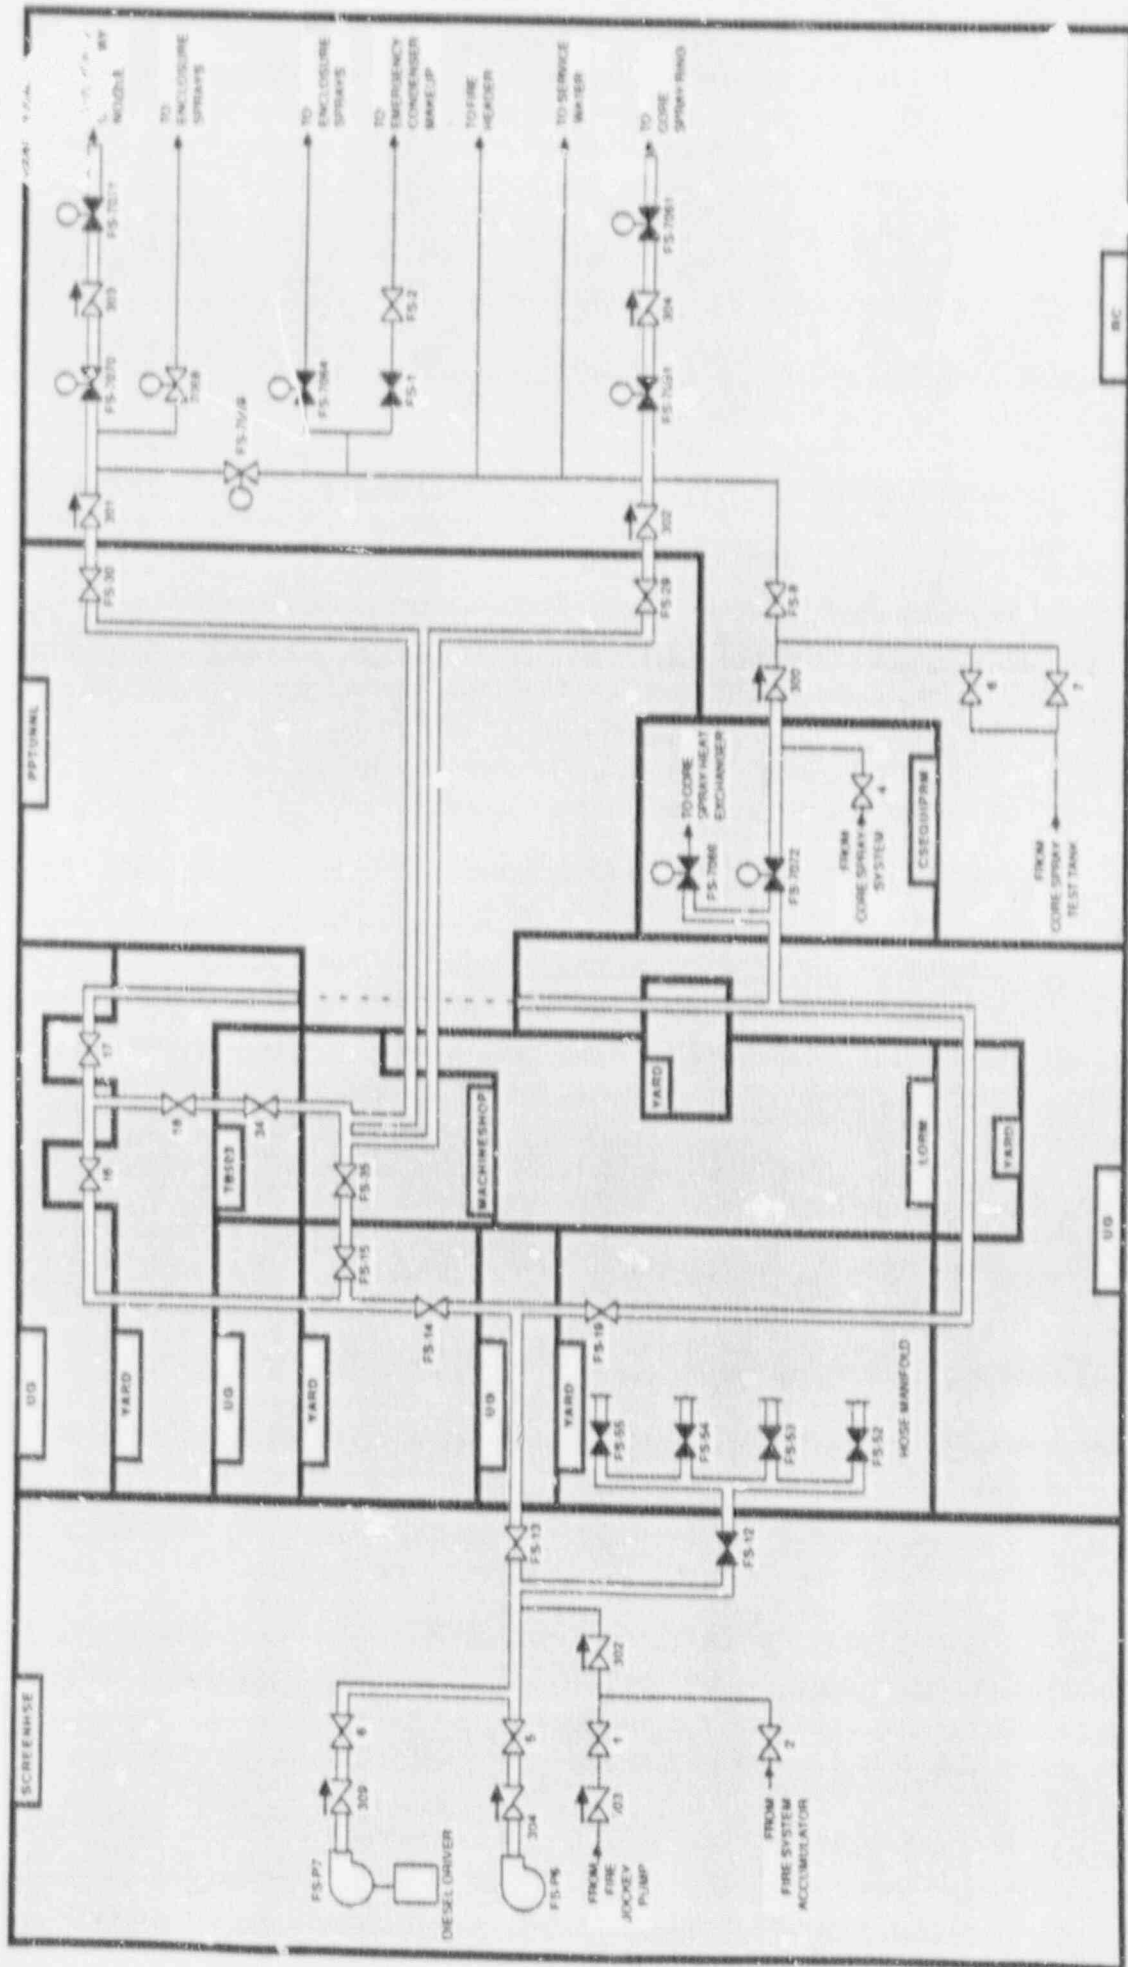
Big Rock Point Fire Protection System Showing Component Locations
